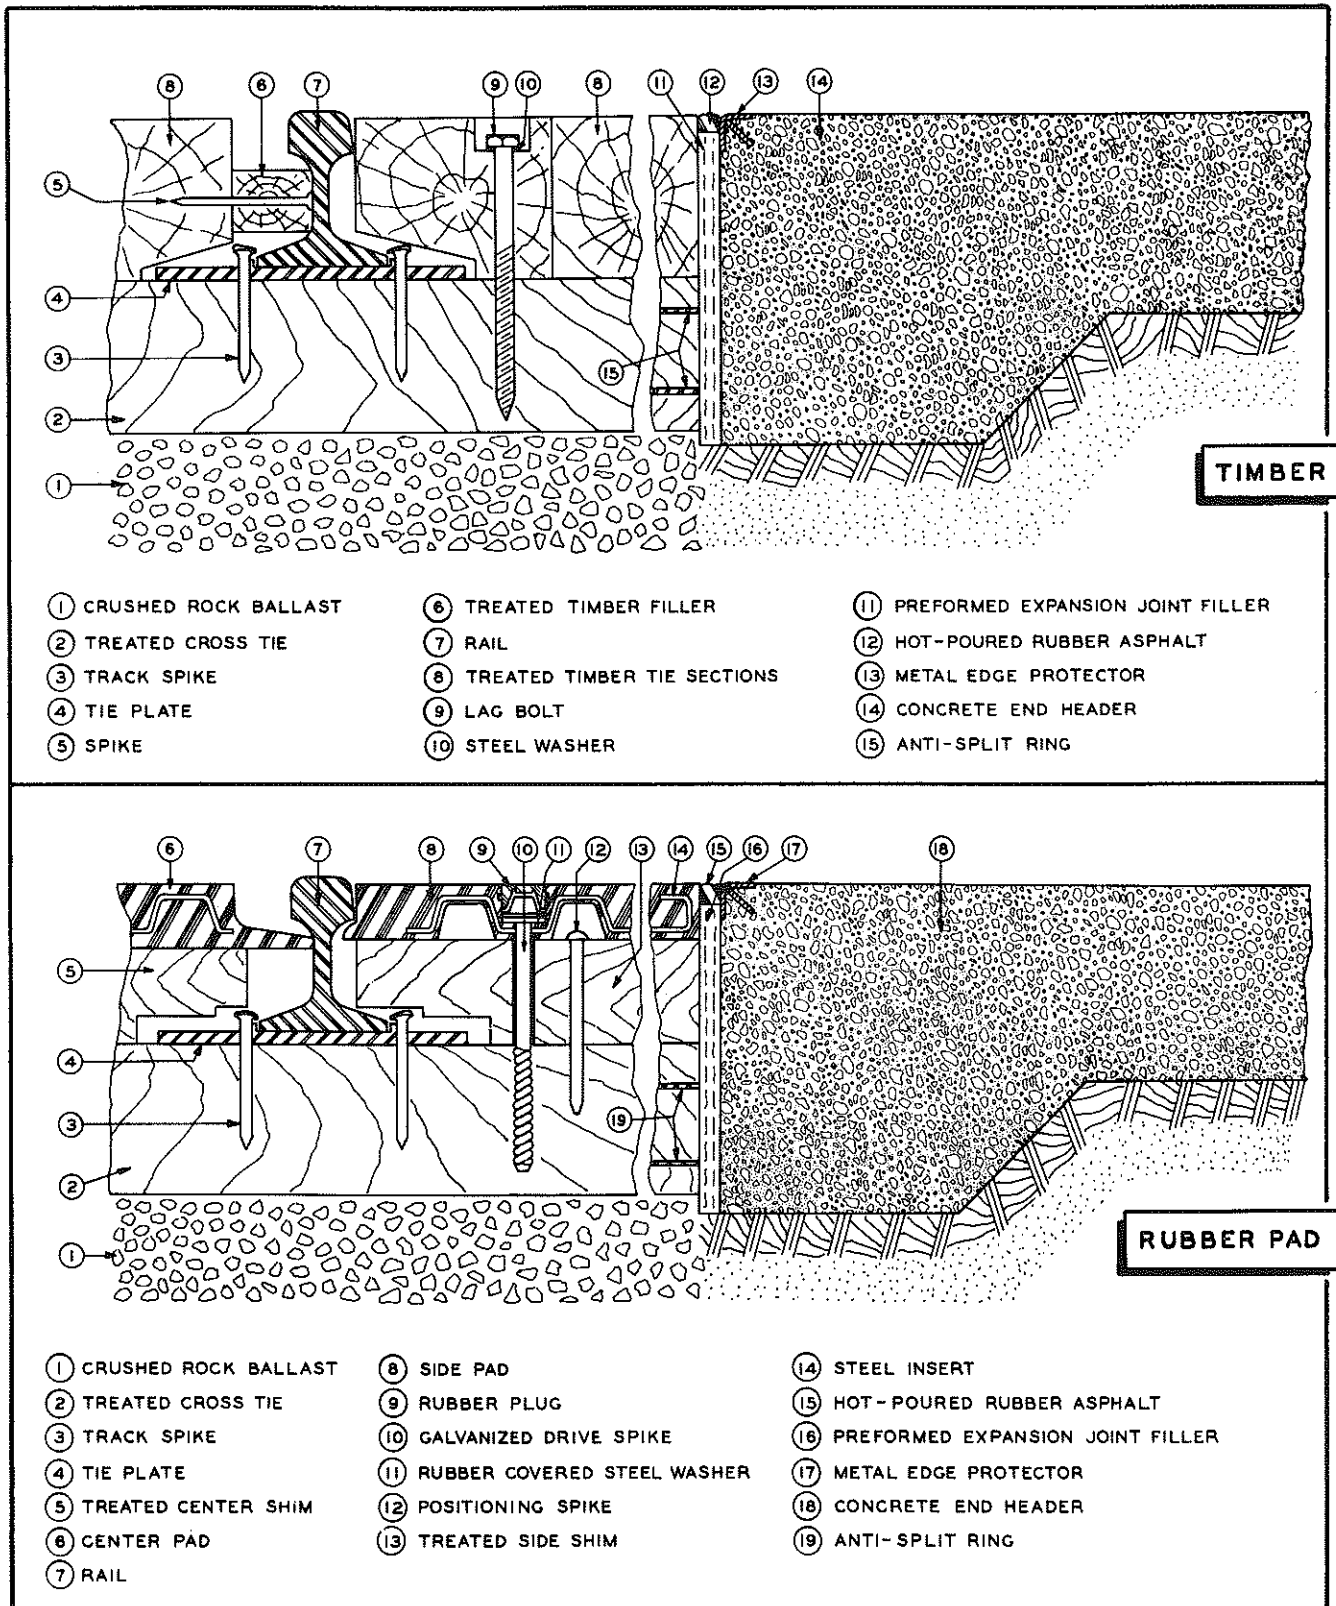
Cross-sectional detail drawings of railroad crossing components.
